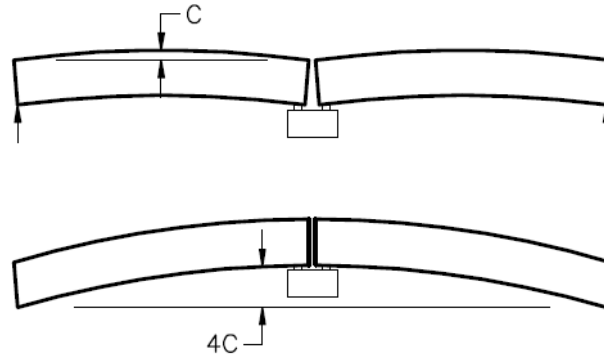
Pier elevation adjustment for a two-span bridge.
